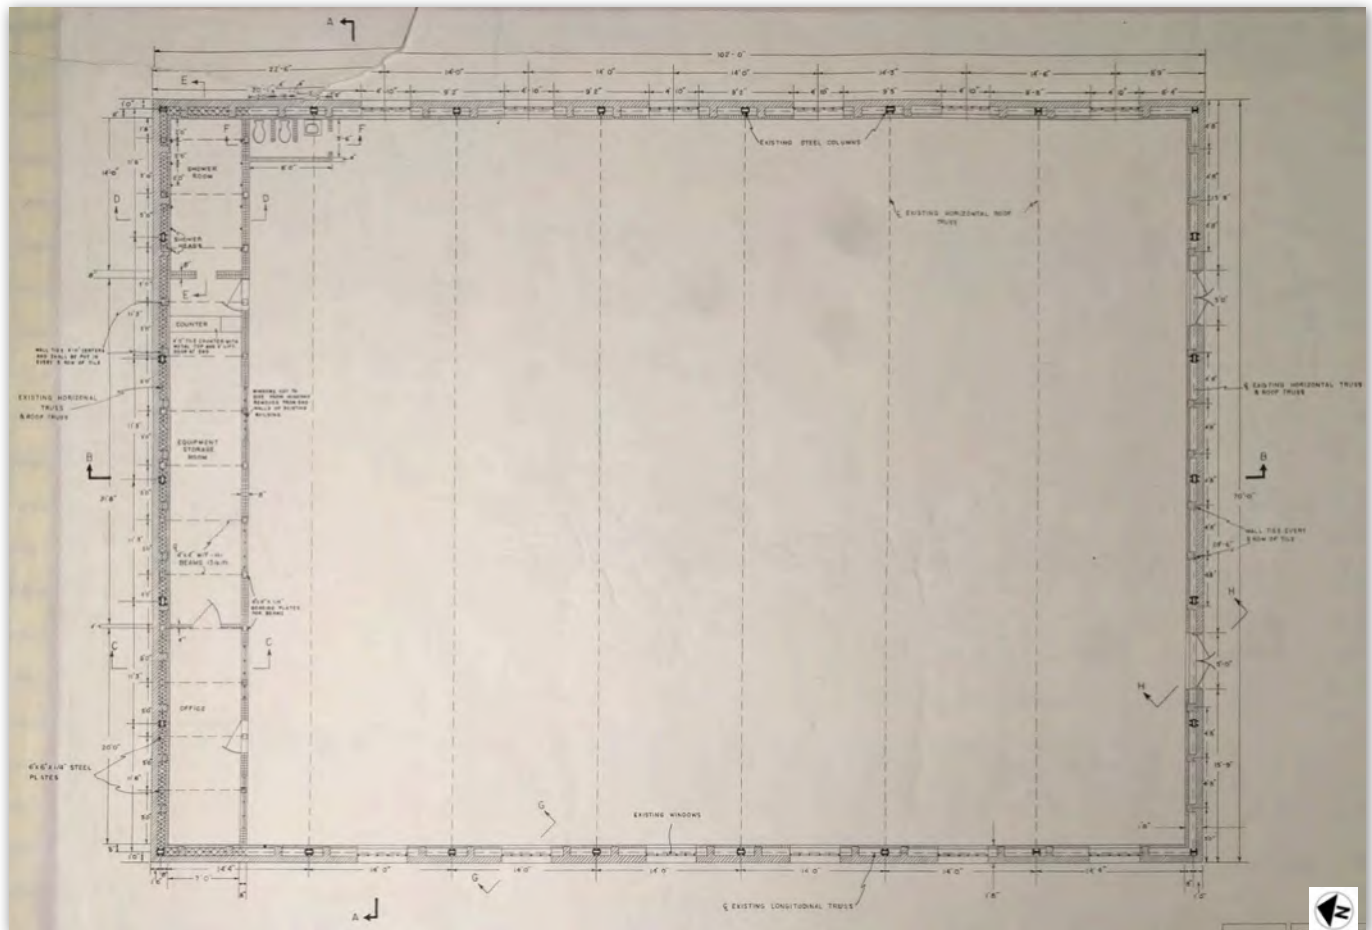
Plan of the Gymnasium from ca. 1960, showing alterations to the north end of the interior (left side of drawing). This drawing, combined with information from historic maps and site plans, suggests that the north bay was added and the building joined to Building 17 at this time (SCI-Pittsburgh Facilities Archive).
